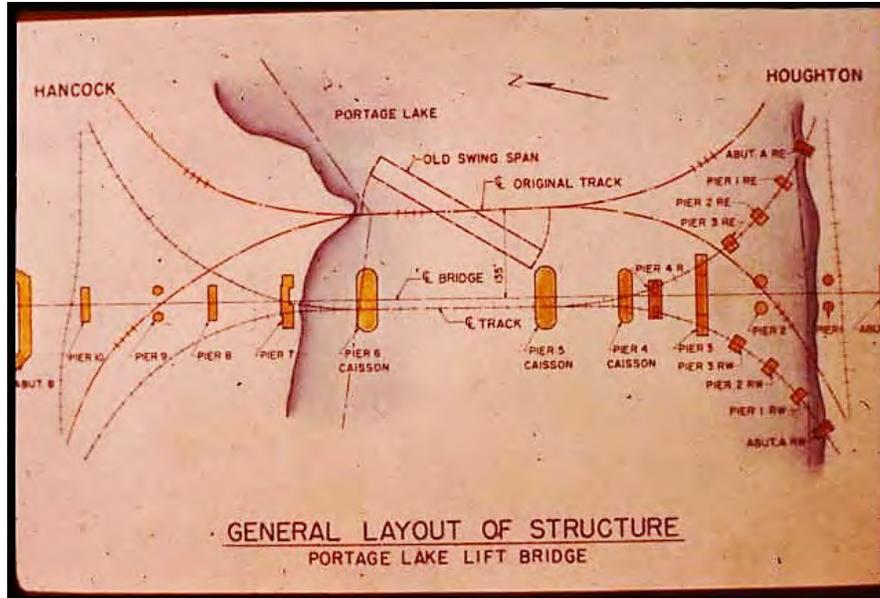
Plan view of old and new Portage Lake bridge layouts [6-23]
